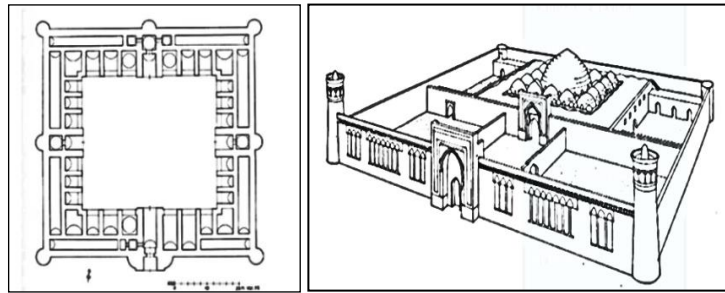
Ground floor plan of Ribat-i Mahi (Korn, 2020, p.12).
